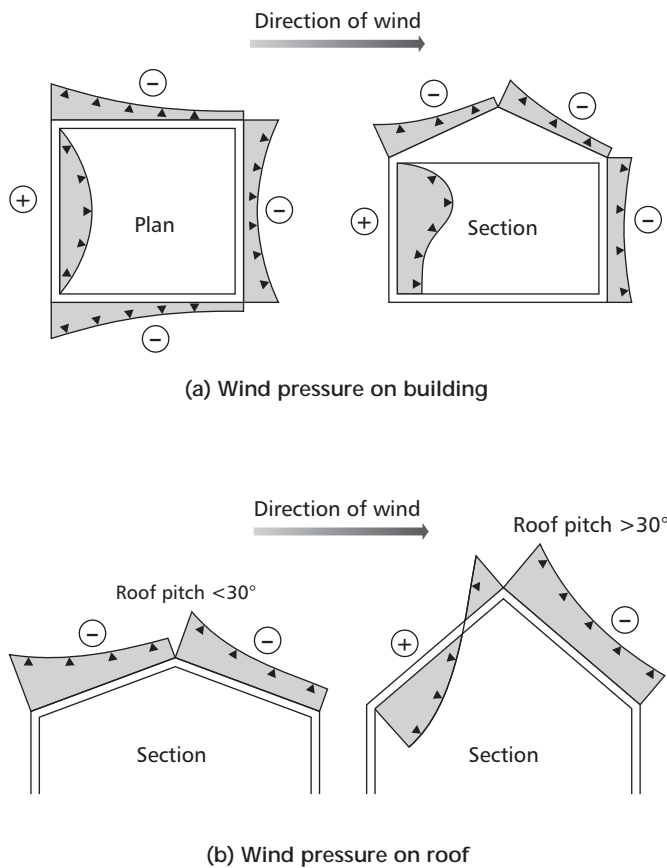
Wind pressure; (a) on building, (b) on roof
